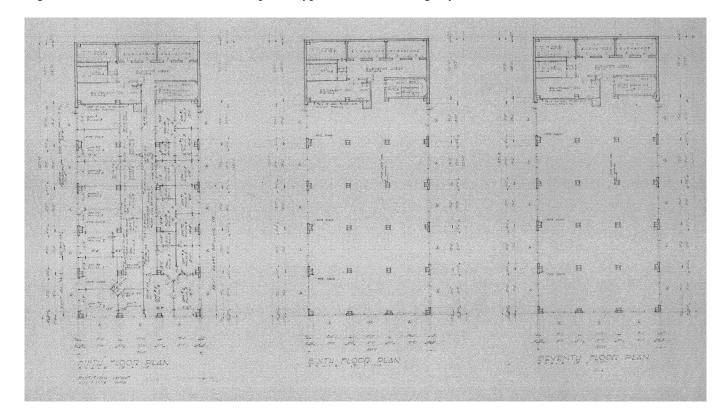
Fifth, sixth, and seventh floor plans (typical), 1952 drawings by David S. Castle.
